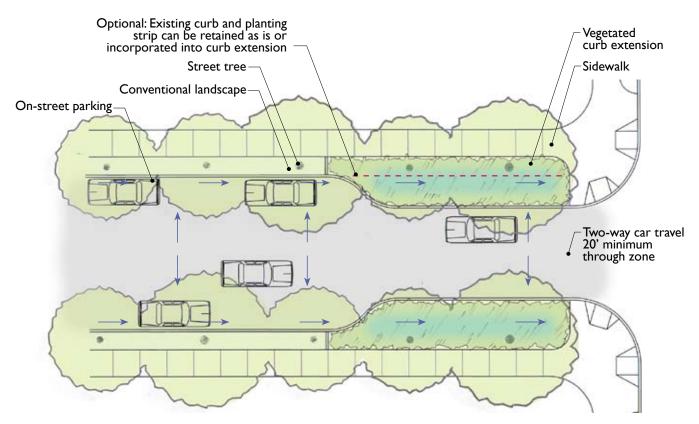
Stormwater Curb Extension at Intersection-Plan View
